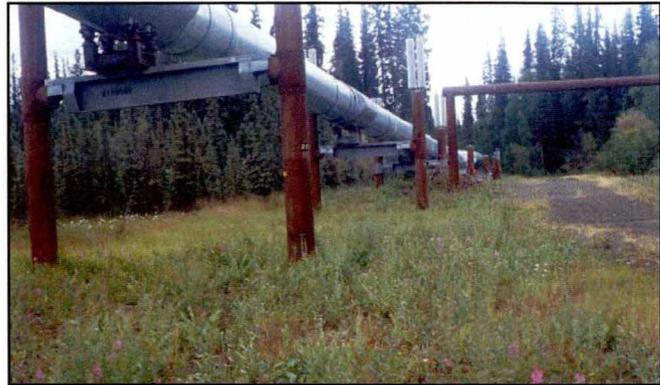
Southward view of elevated pipe. Shrubs and trees have encroached beneath the pipe. Though recently cut by the pipeline company, the stumps have sprouted and are rapidly replacing the canopy. The roadway is largely barren gravel, lined with low grasses.
